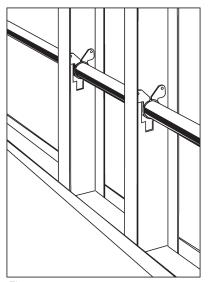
Suspension clip fasteners used to protect tubing from abraison when passng through steel studs.
